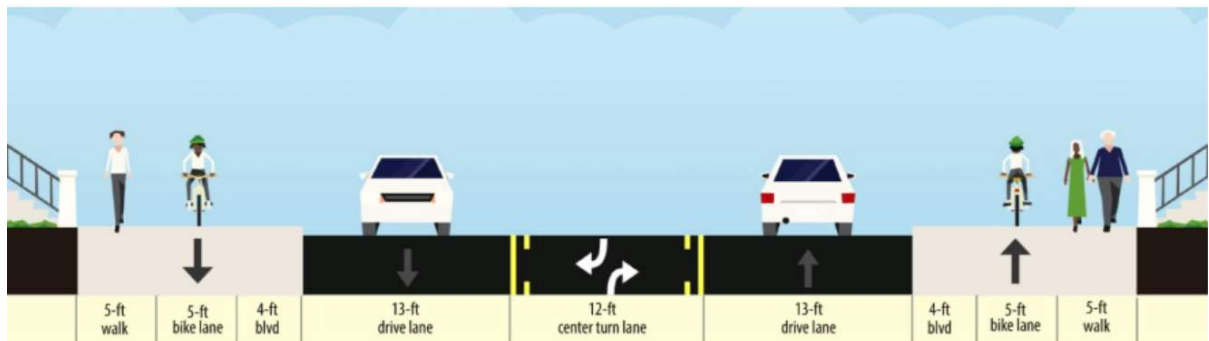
Recommended Typical Section (Broad to Val Imm)
